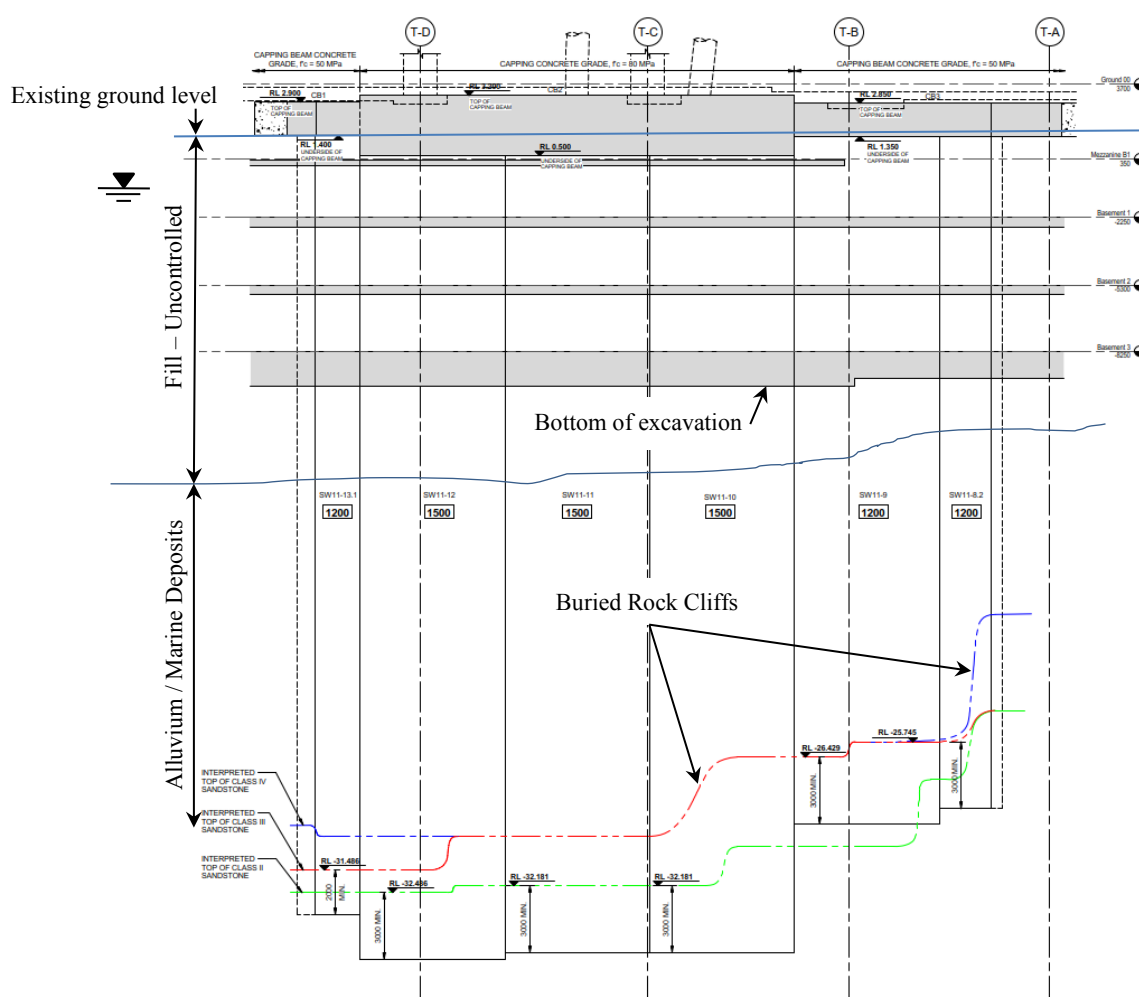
Typical diaphragm wall elevation showing ground conditions, rock level variation and buried cliff lines
